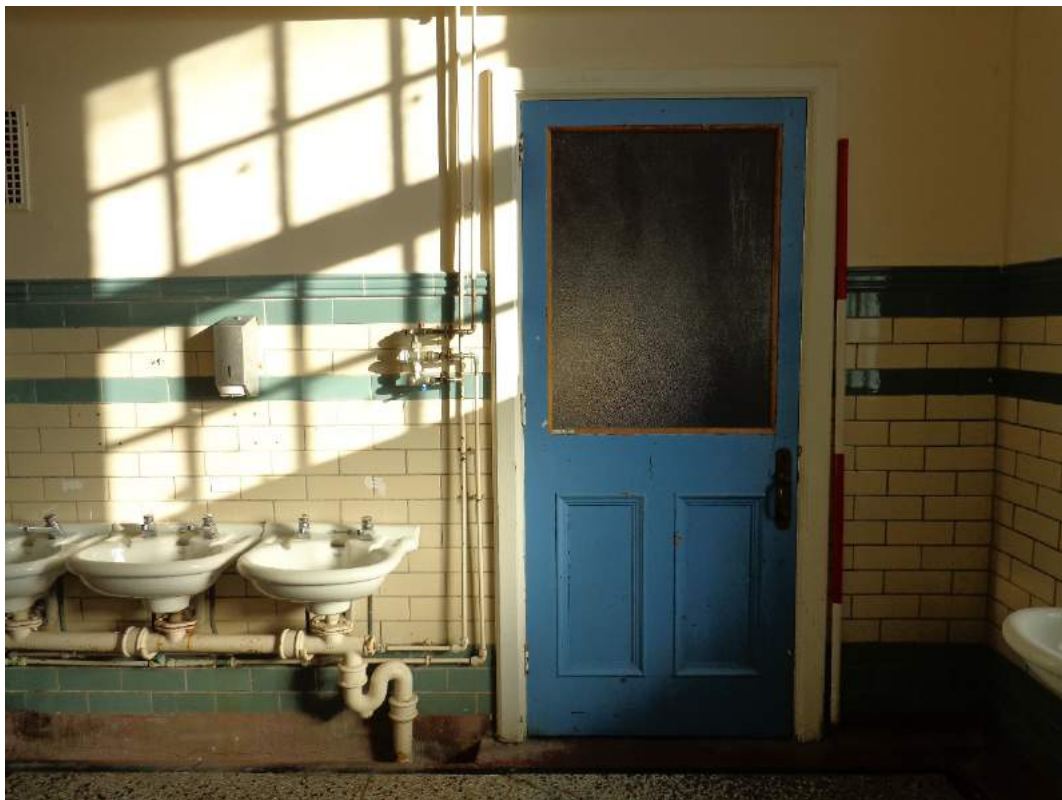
View of boys' WC lobby (6), with access to boys' western entry hall (95); shot facing east.
